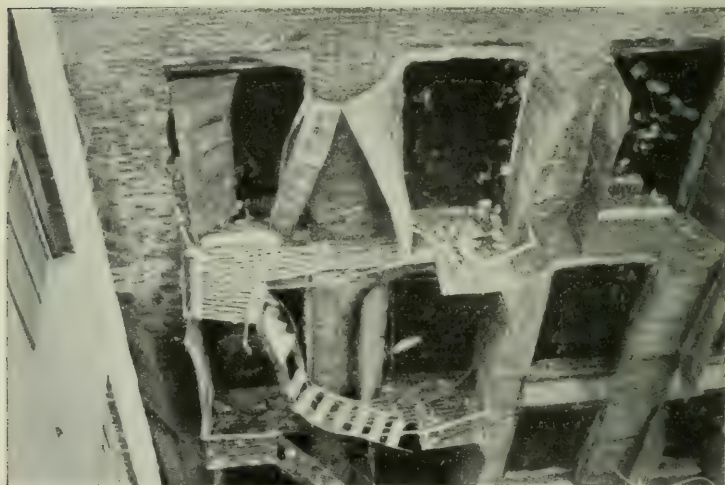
Asch Building, New York. Efficiency of the sole "Fire Escape" to this Building.
